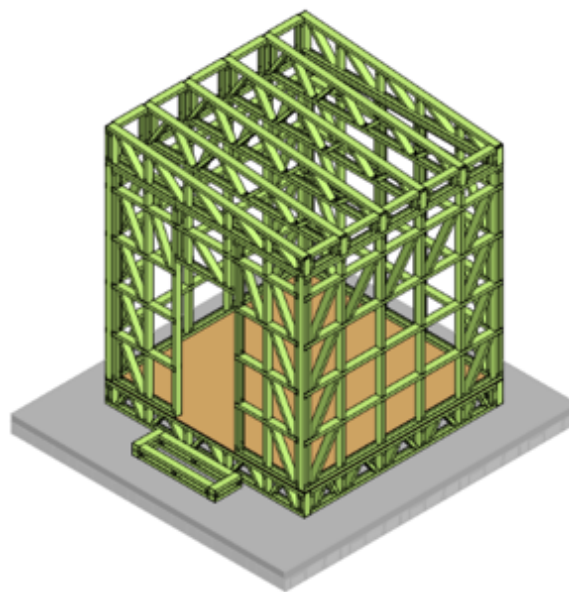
Example of steel section structure in LSF construction (Rosa, 2018).
